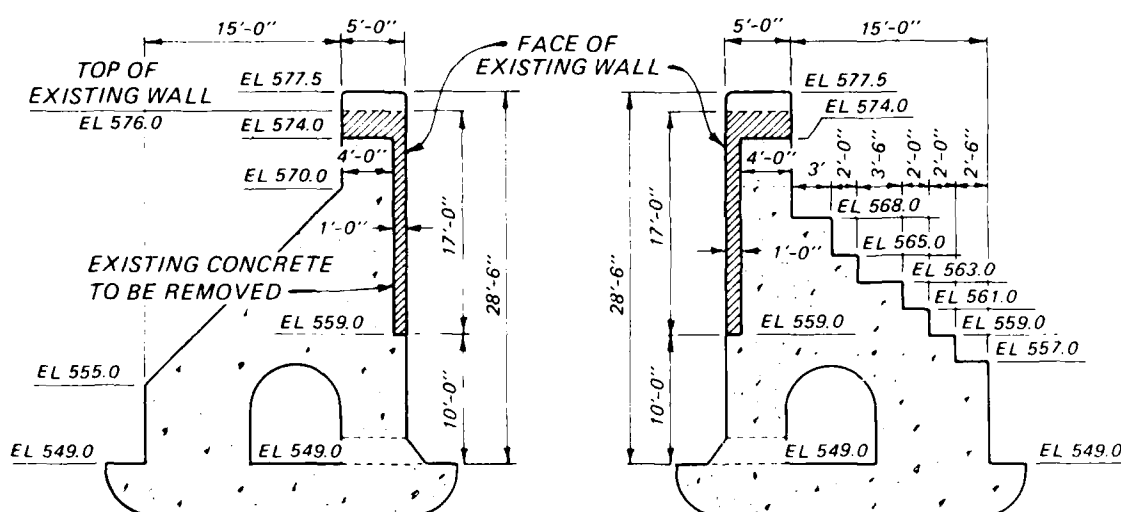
Typical sections showing extent of concrete removal and replacement, Old Lock No. 14, Mississippi River
